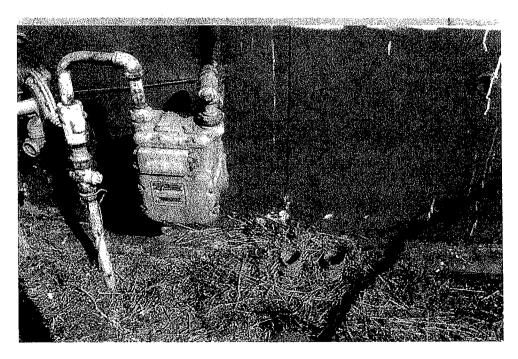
View looking at the suspect vent pipes to the west of the main subject property. building
